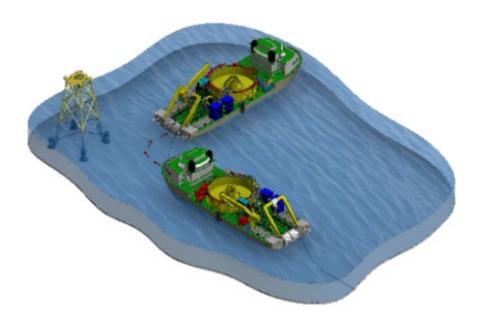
Lay vessel second end approach to structure (illustrative image only; note that Moray West utilises monopile foundations, not jacket foundations)
